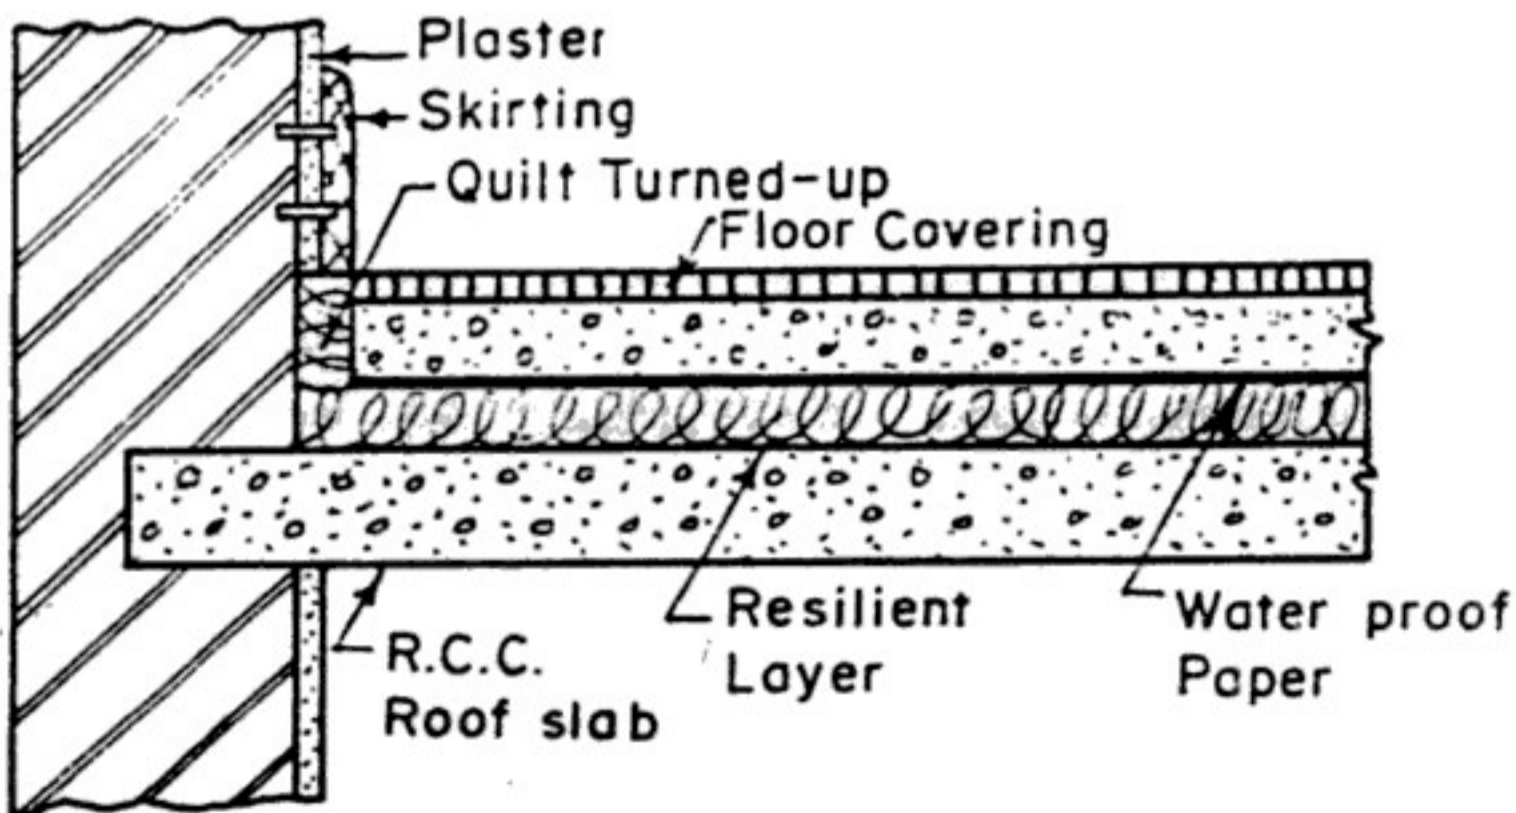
CONCRETE FLOOR FLOATING CONSTRUCTION.
